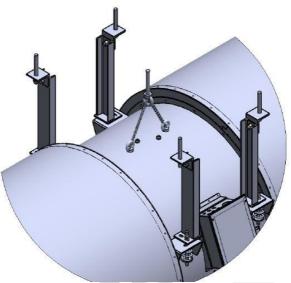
Installation Detail of Tunnel Fan Connection Apparatus
